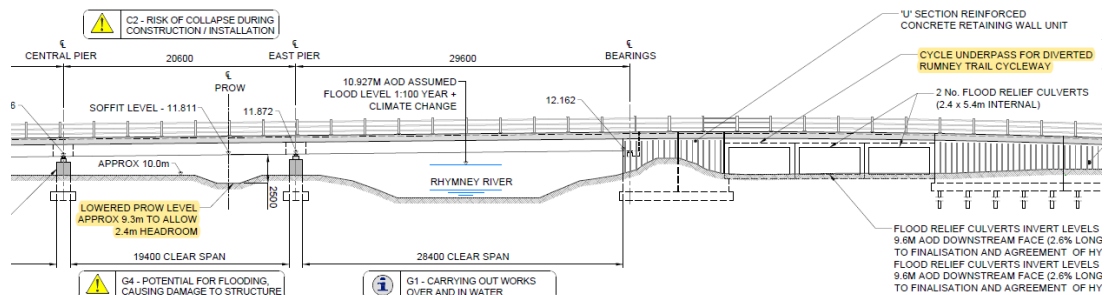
Extract from Highway Plan identifying changes to levels to accommodate routes of existing PRow to north and south of the River below new bridge structure
